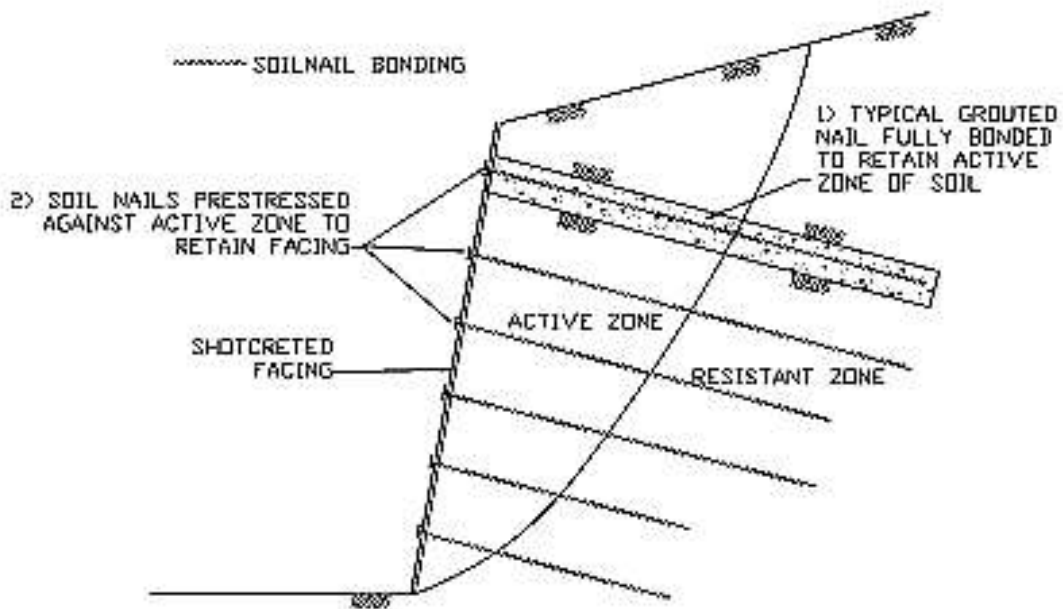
Steep slope stabilisation with soil nails used for dual purpose.
